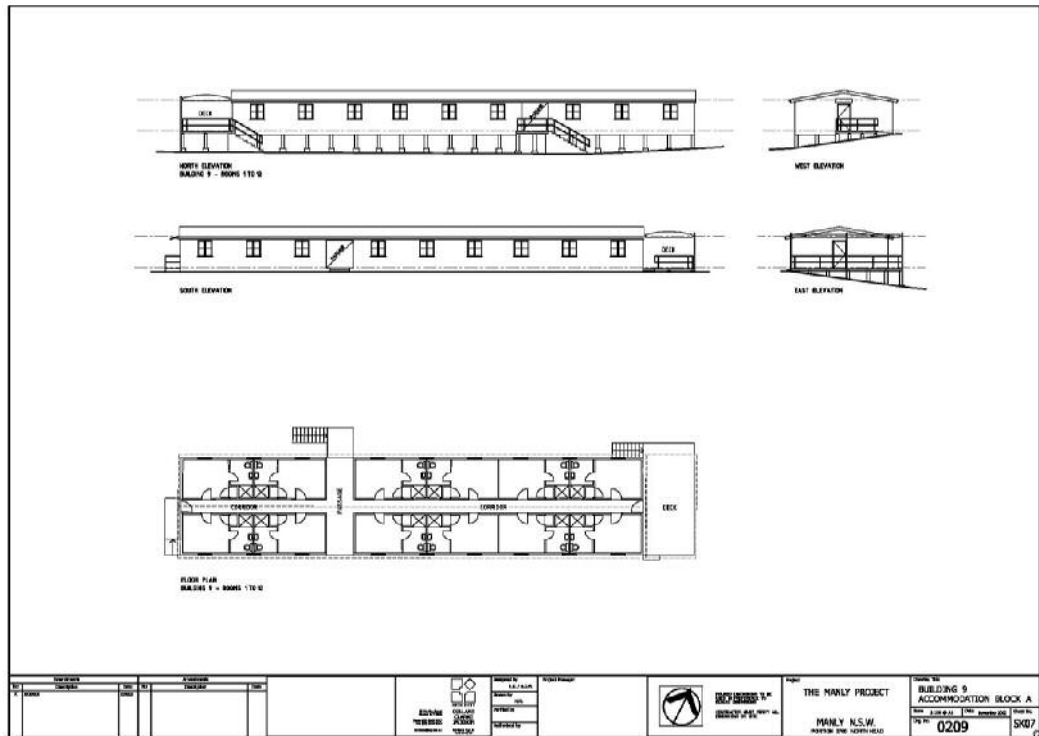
Drawing showing dormitory building. Collard Clarke Jackson Architects - March 2003.
